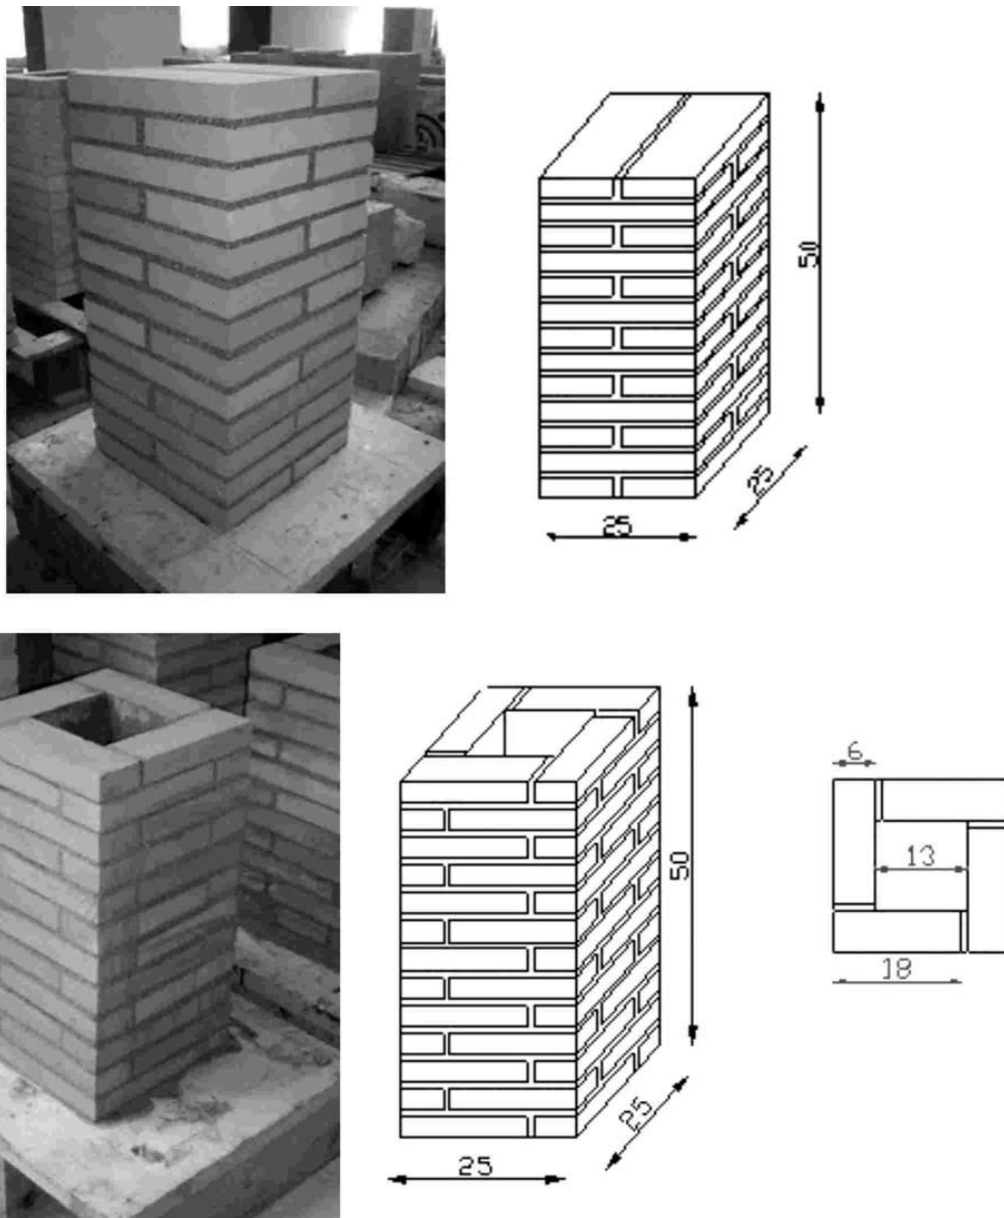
Dimensions of masonry columns in centimetres (Aiello et al., 2009).
